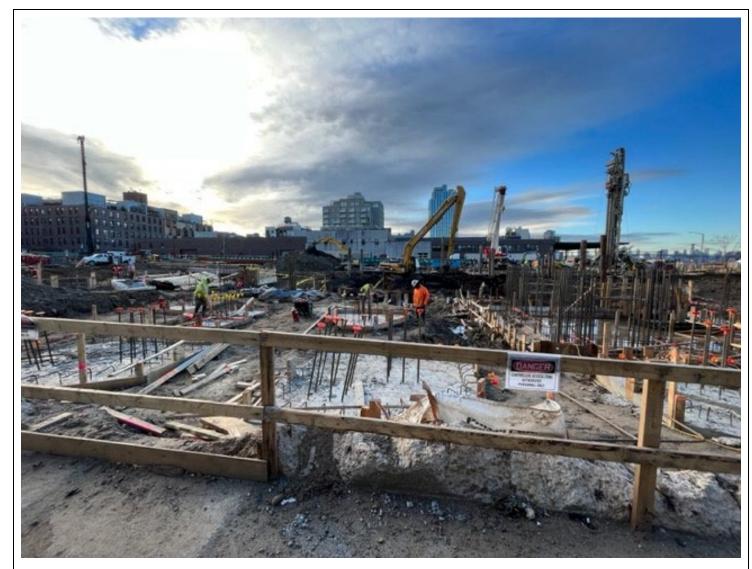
View facing south, CCJV & Atlantic Reinforcing installing foundation elements in grid cells SC-8.
